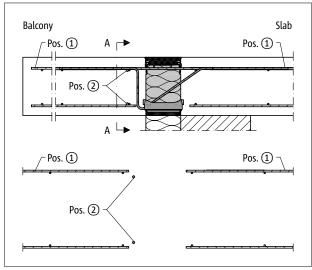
Schöck Isokorb® XT type K: on-site reinforcement with direct support
